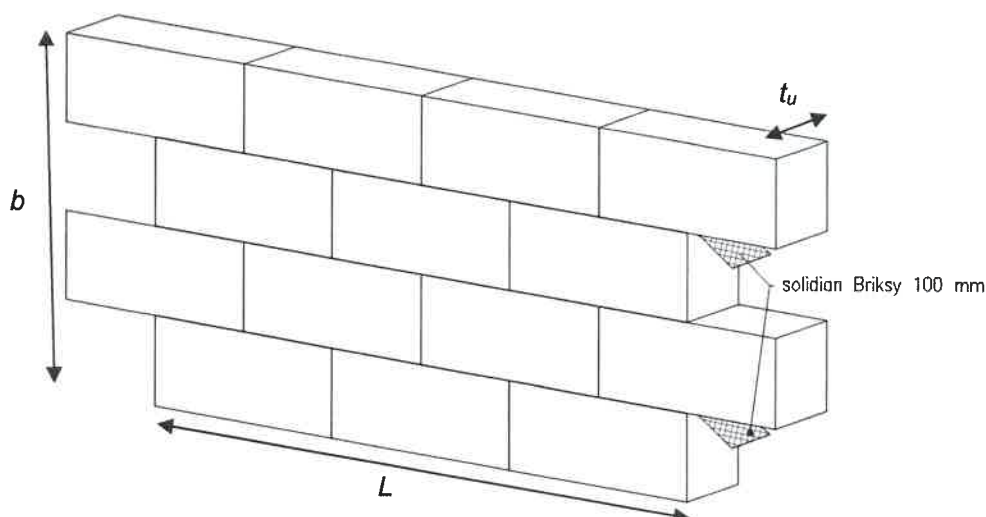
Scheme of masonry reinforcement embedded in test specimen
